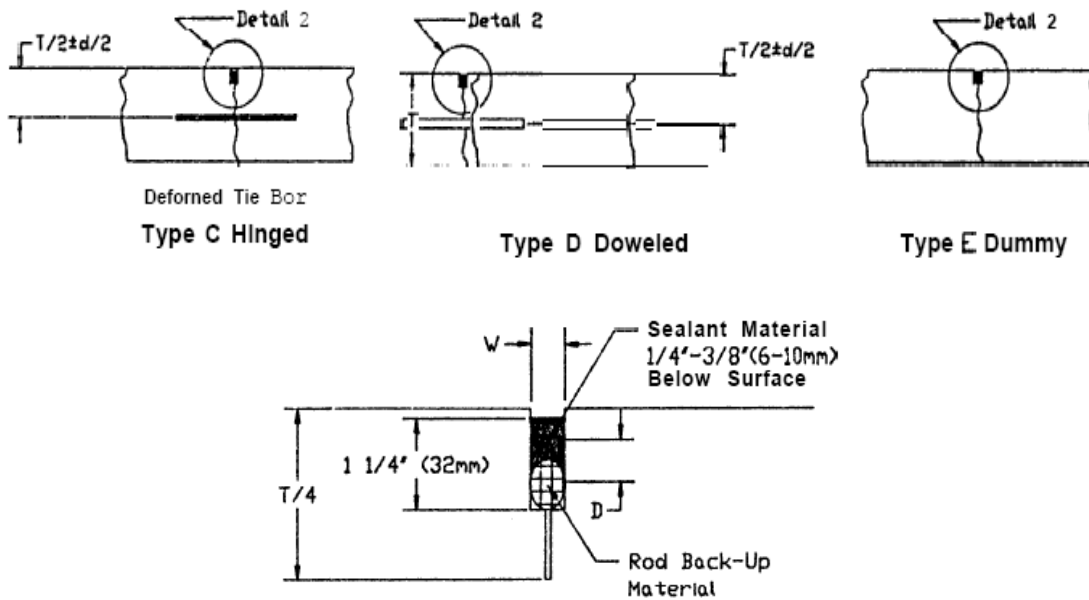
Contraction joint details for light load rigid pavement per AC 150/5320-6D.
